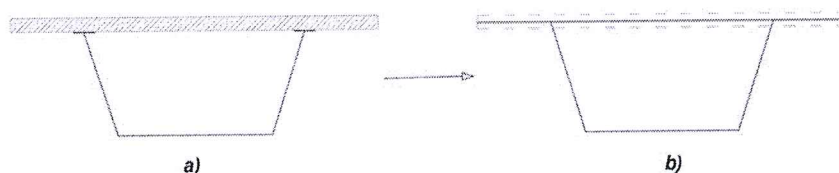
Typical cross-section of a composite box girder and b) equivalent homogenized cross-section
